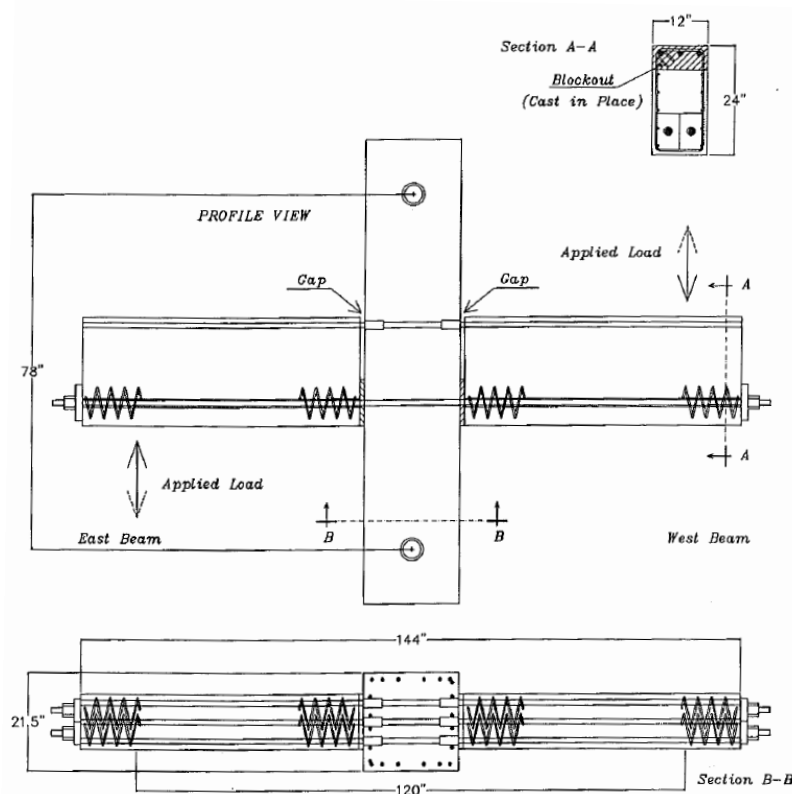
UMn-GAP connection detail (Palmieri et al., 1996).
